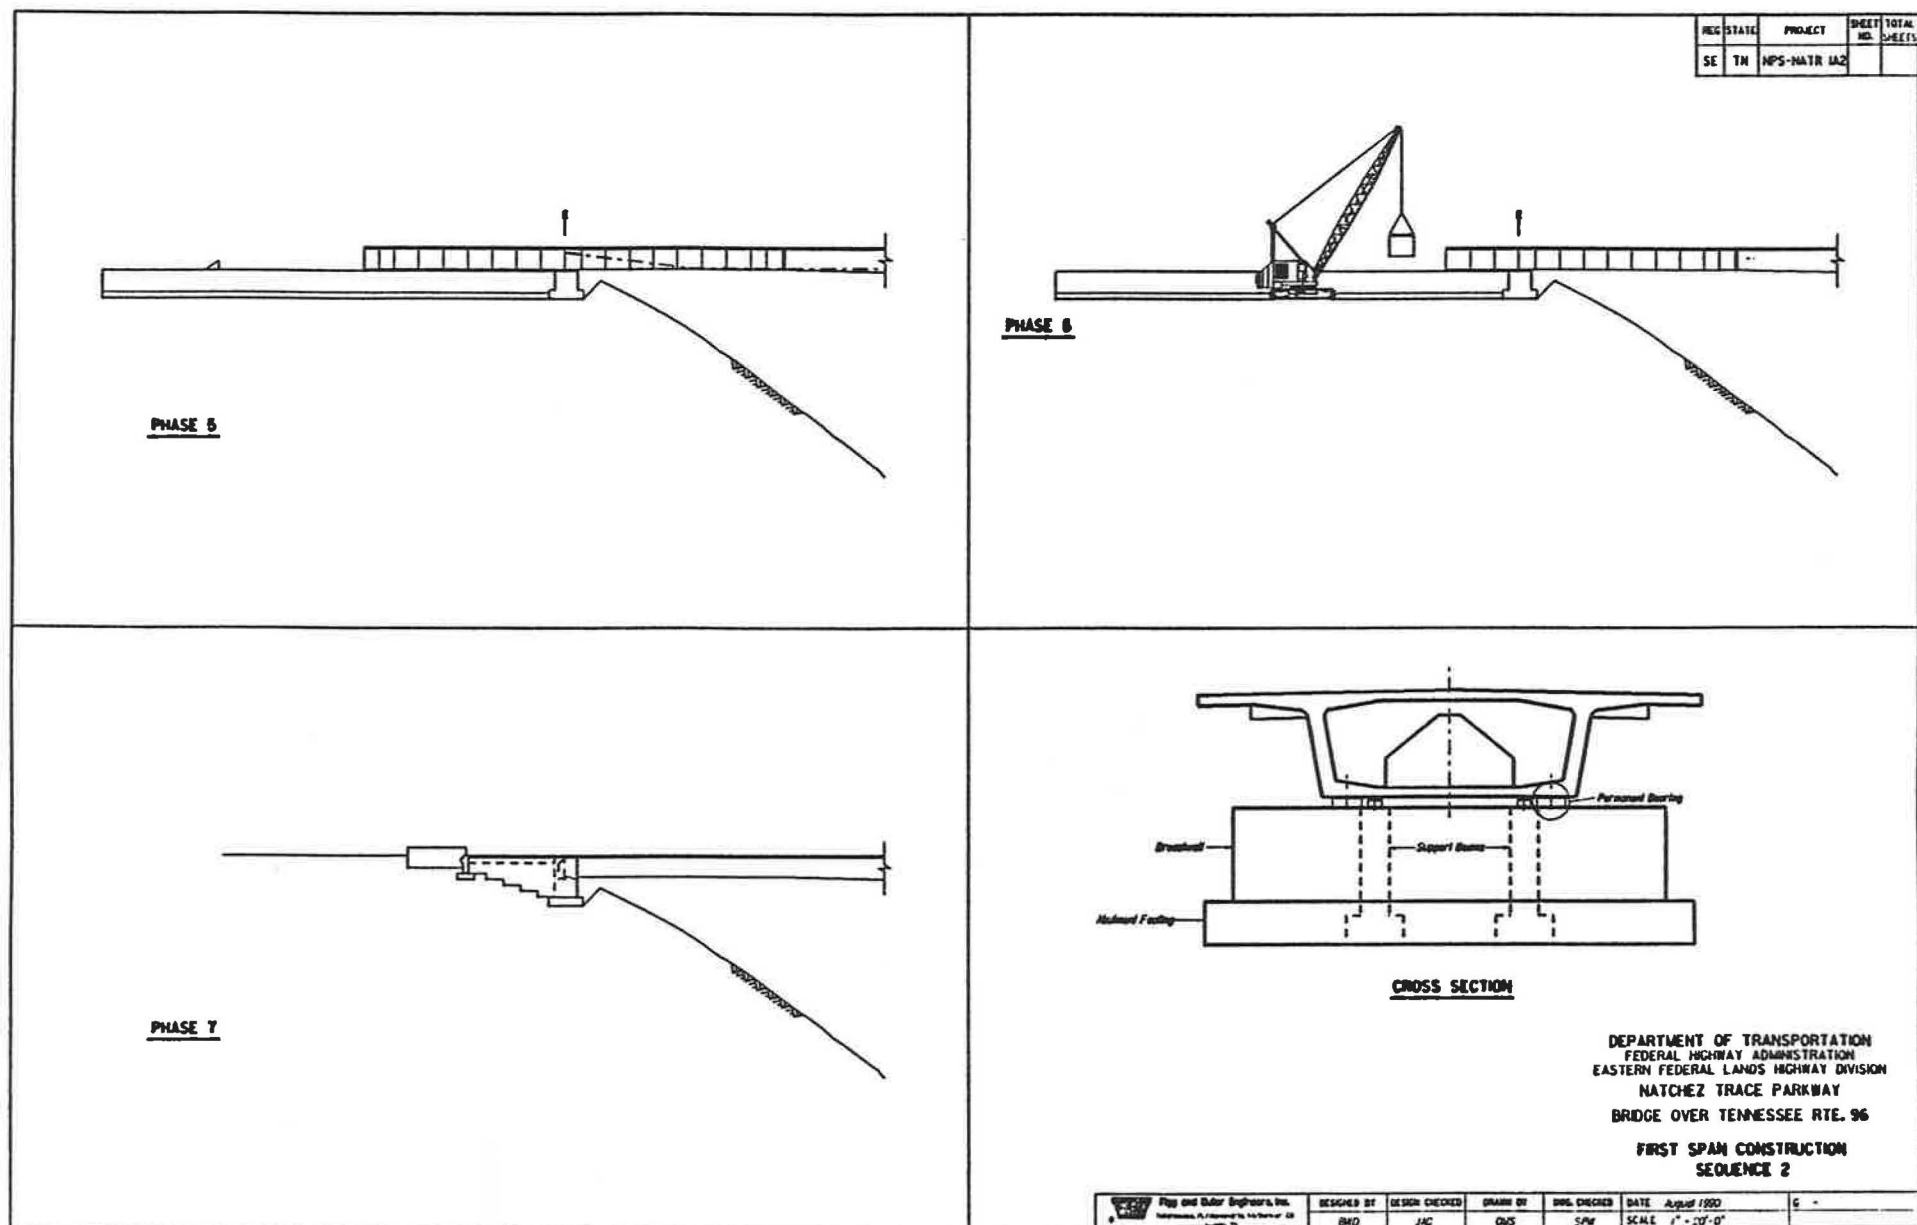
First span construction - precast alternate - phases 5, 6, and 7
